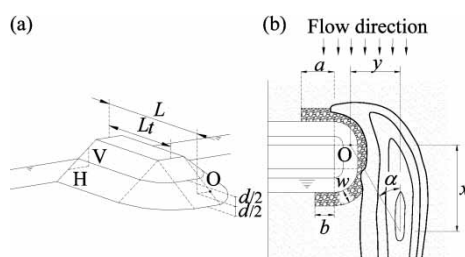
(a) Perspective and (b) schematic plan view of spill-through abutments
